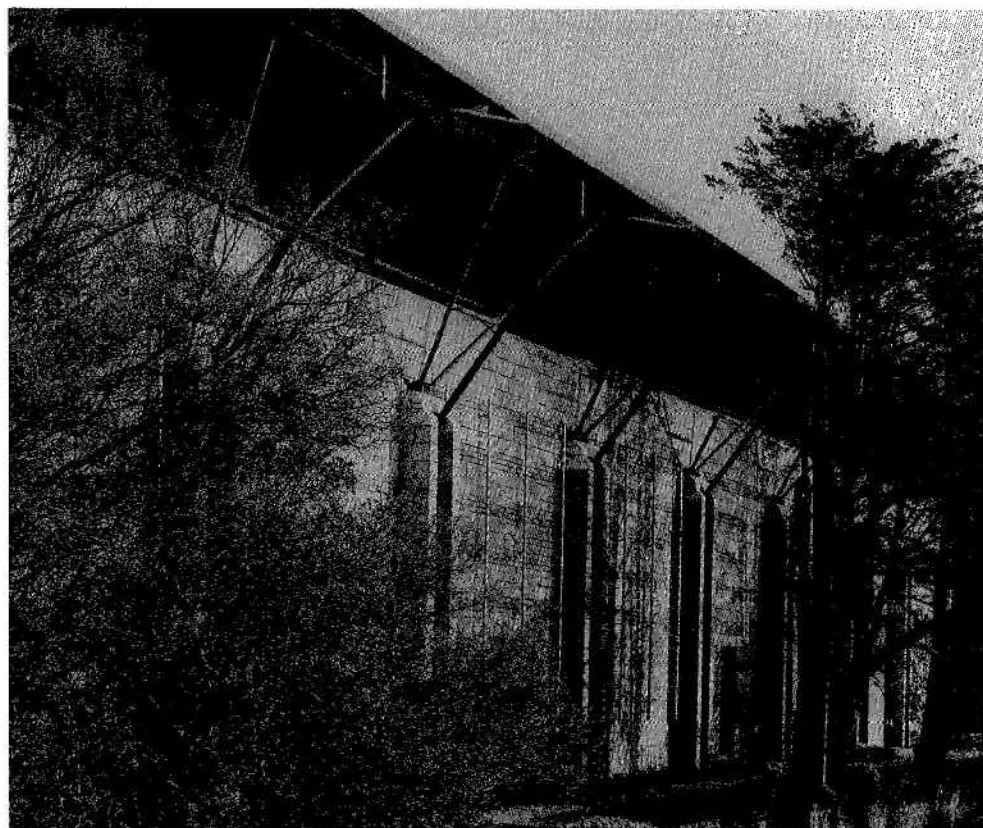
External elevation showing warehouse cladding and eaves detail
